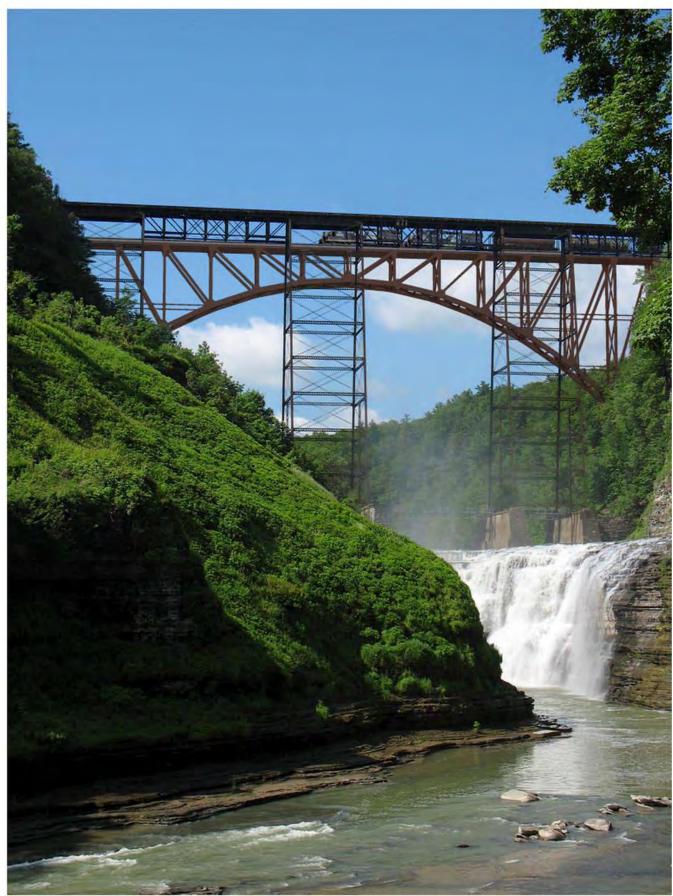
Viewpoint A\_Existing and New Bridge.jpg
